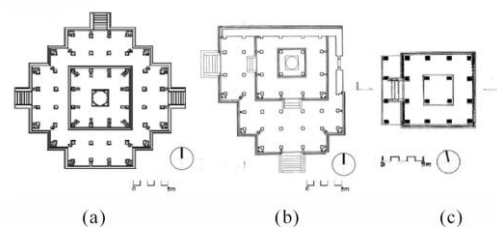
(a). Plan of South-East Kalyana Mandapa, (b). Plan of North-East Utsava Mandapa, (c). Plan of Utsava Mandapa at the end of Bazaar Street
